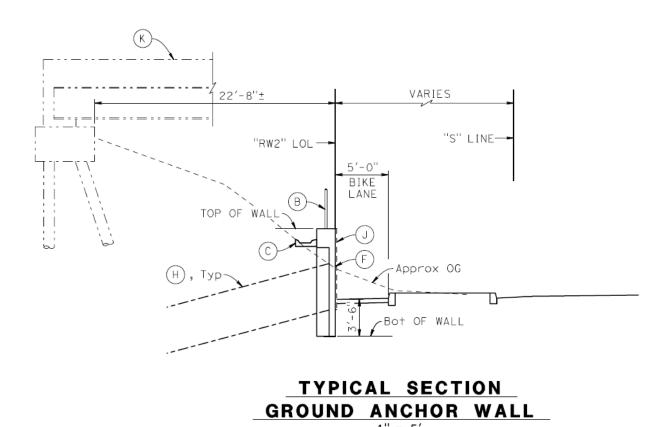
Typical Section of a Ground Anchor Wall
